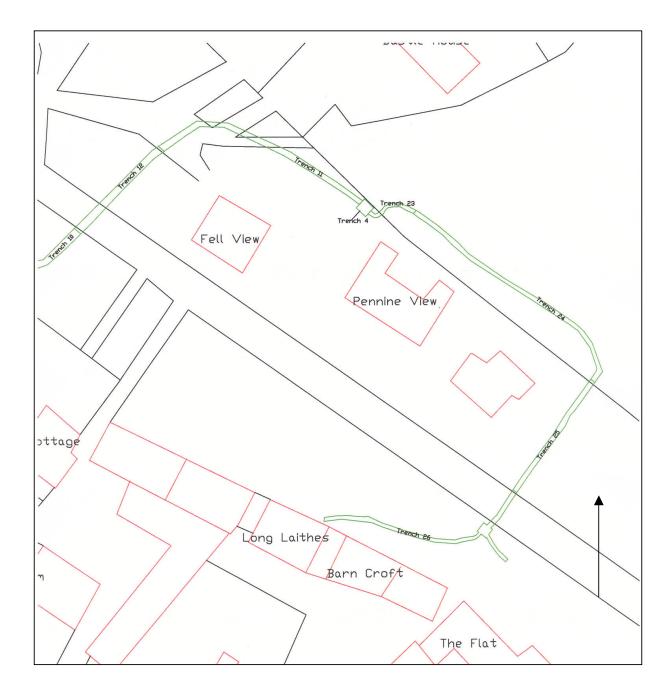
Trench Location Plan. East of the village, showing trenches 4,10-12, 23-26. Scale. 1:500 @A4
